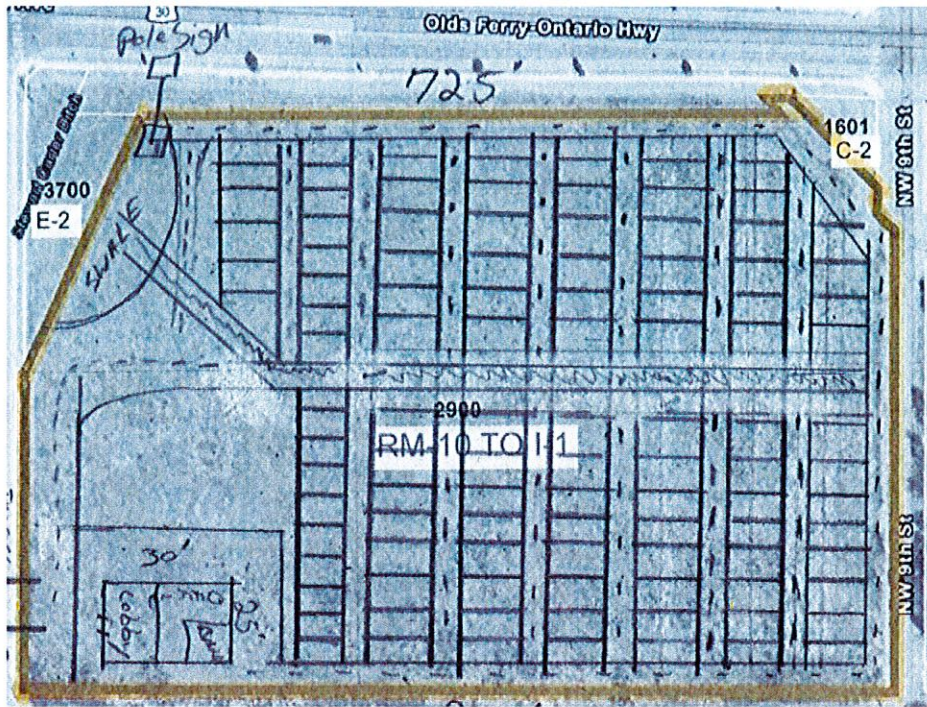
Rough Site Plan for Proposed Indoor Storage Units
